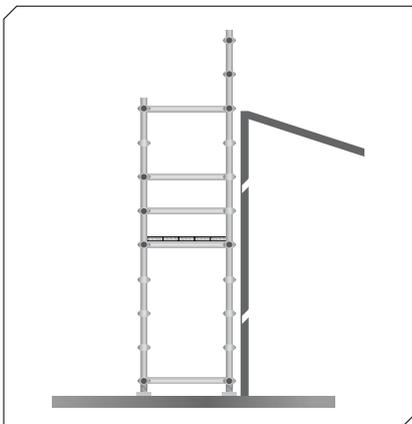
(g): Inside standards supporting guardrailing adjacent to a roof structure that slopes away from the top edge.
